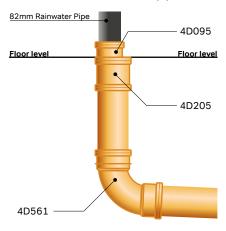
Connection of RoundLine rainwater pipe to Wavin OsmaDrain 110mm spigot
